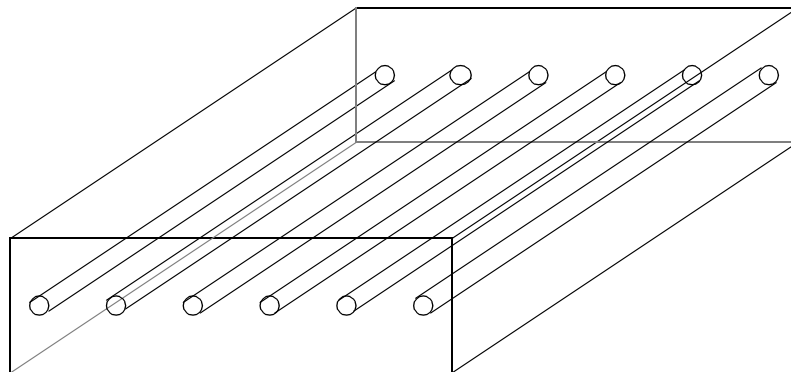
Structure of a cooled ceiling with imbedded pipes.
